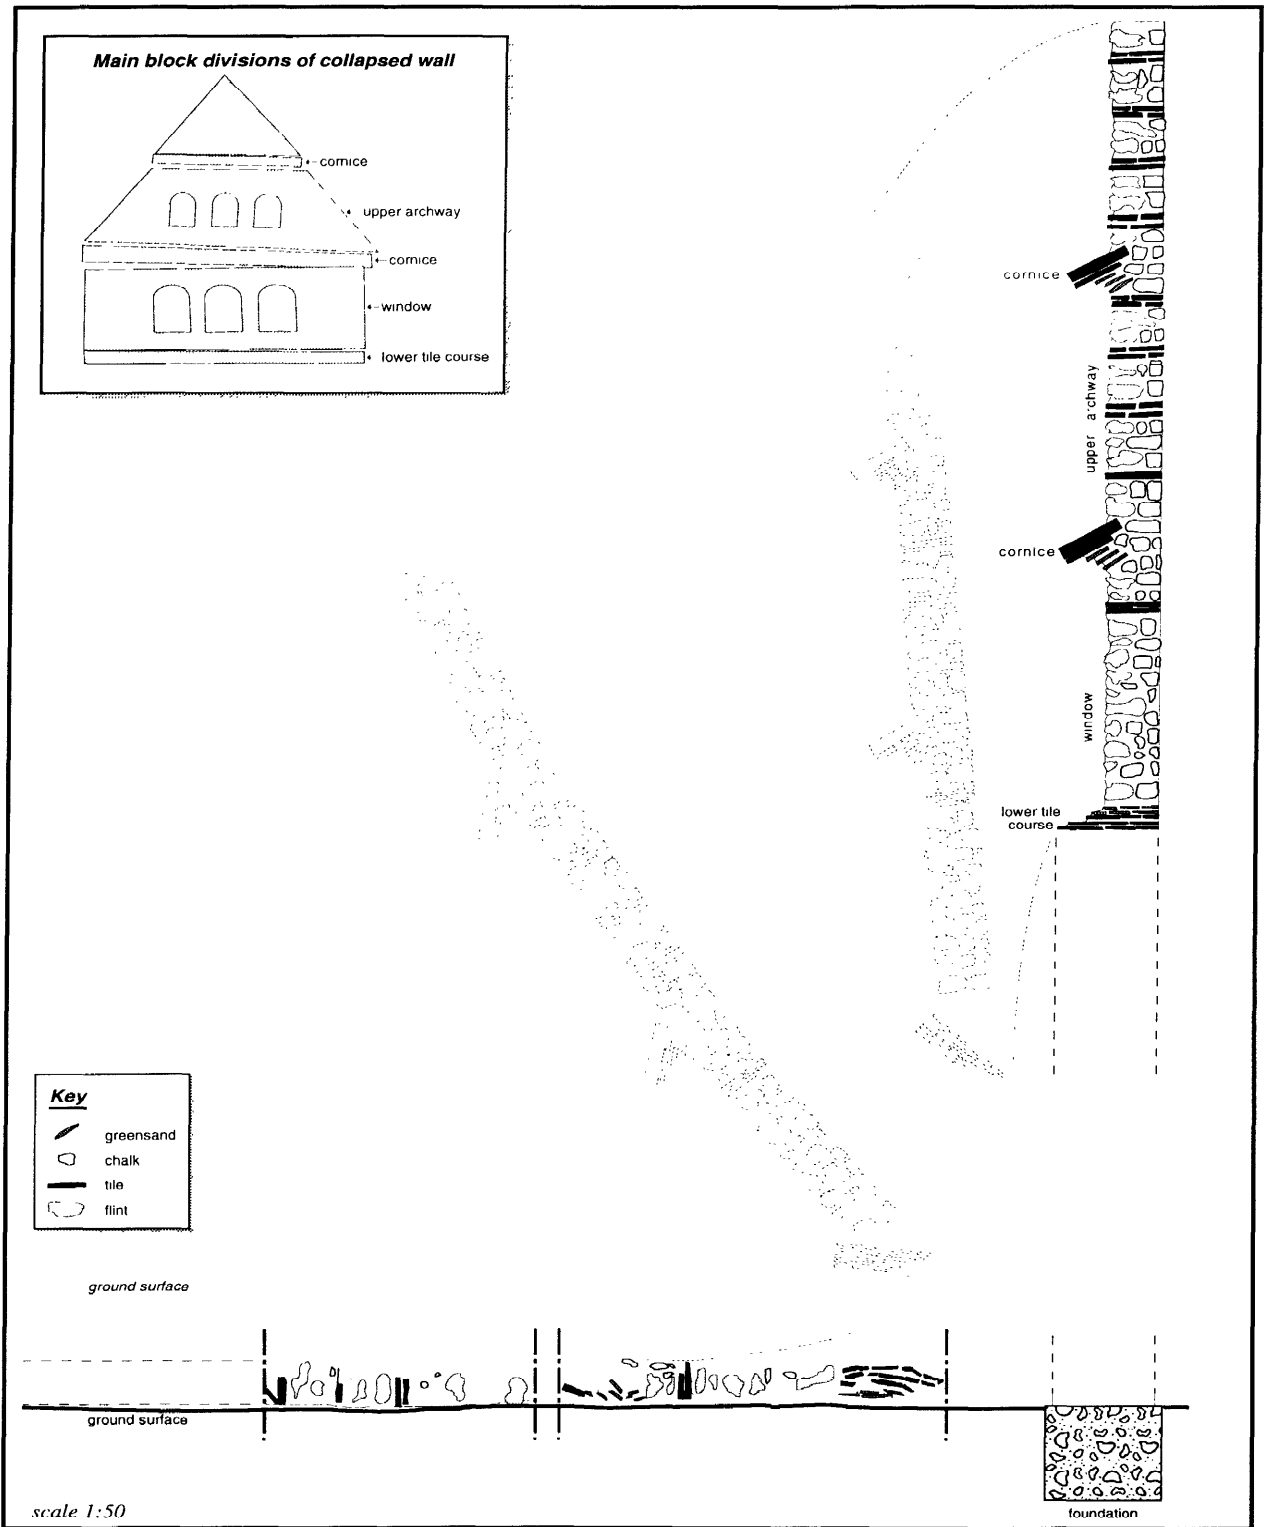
Meonstoke: diagram to show how the wall may have fallen to the ground. Inset: diagram of fracture zones in the fallen façade
